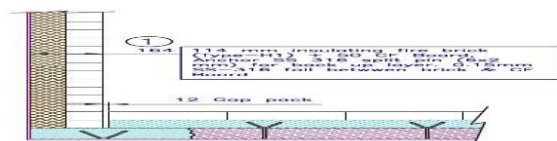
Lining at Floor to Sidewall Problems Faced Due To The Loss Of Heat
